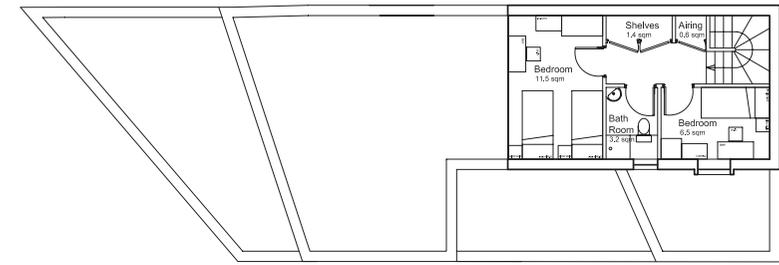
Hannibal Road Gardens: Floor plans, six bed unit.
